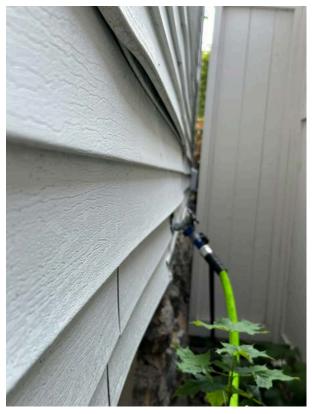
SEPARATED VINYL SIDING ALLOWING WATER INFILTRATIONLEFT ELEVATION
